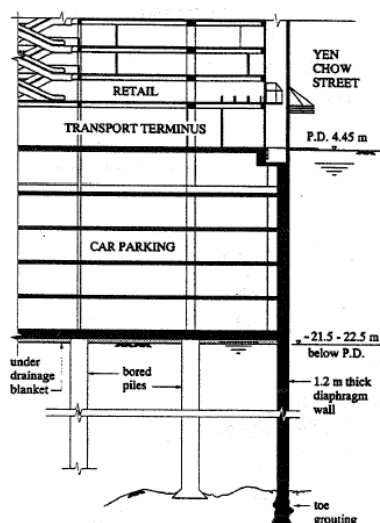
Dragon Centre excavation (Malone et al. 1997)
